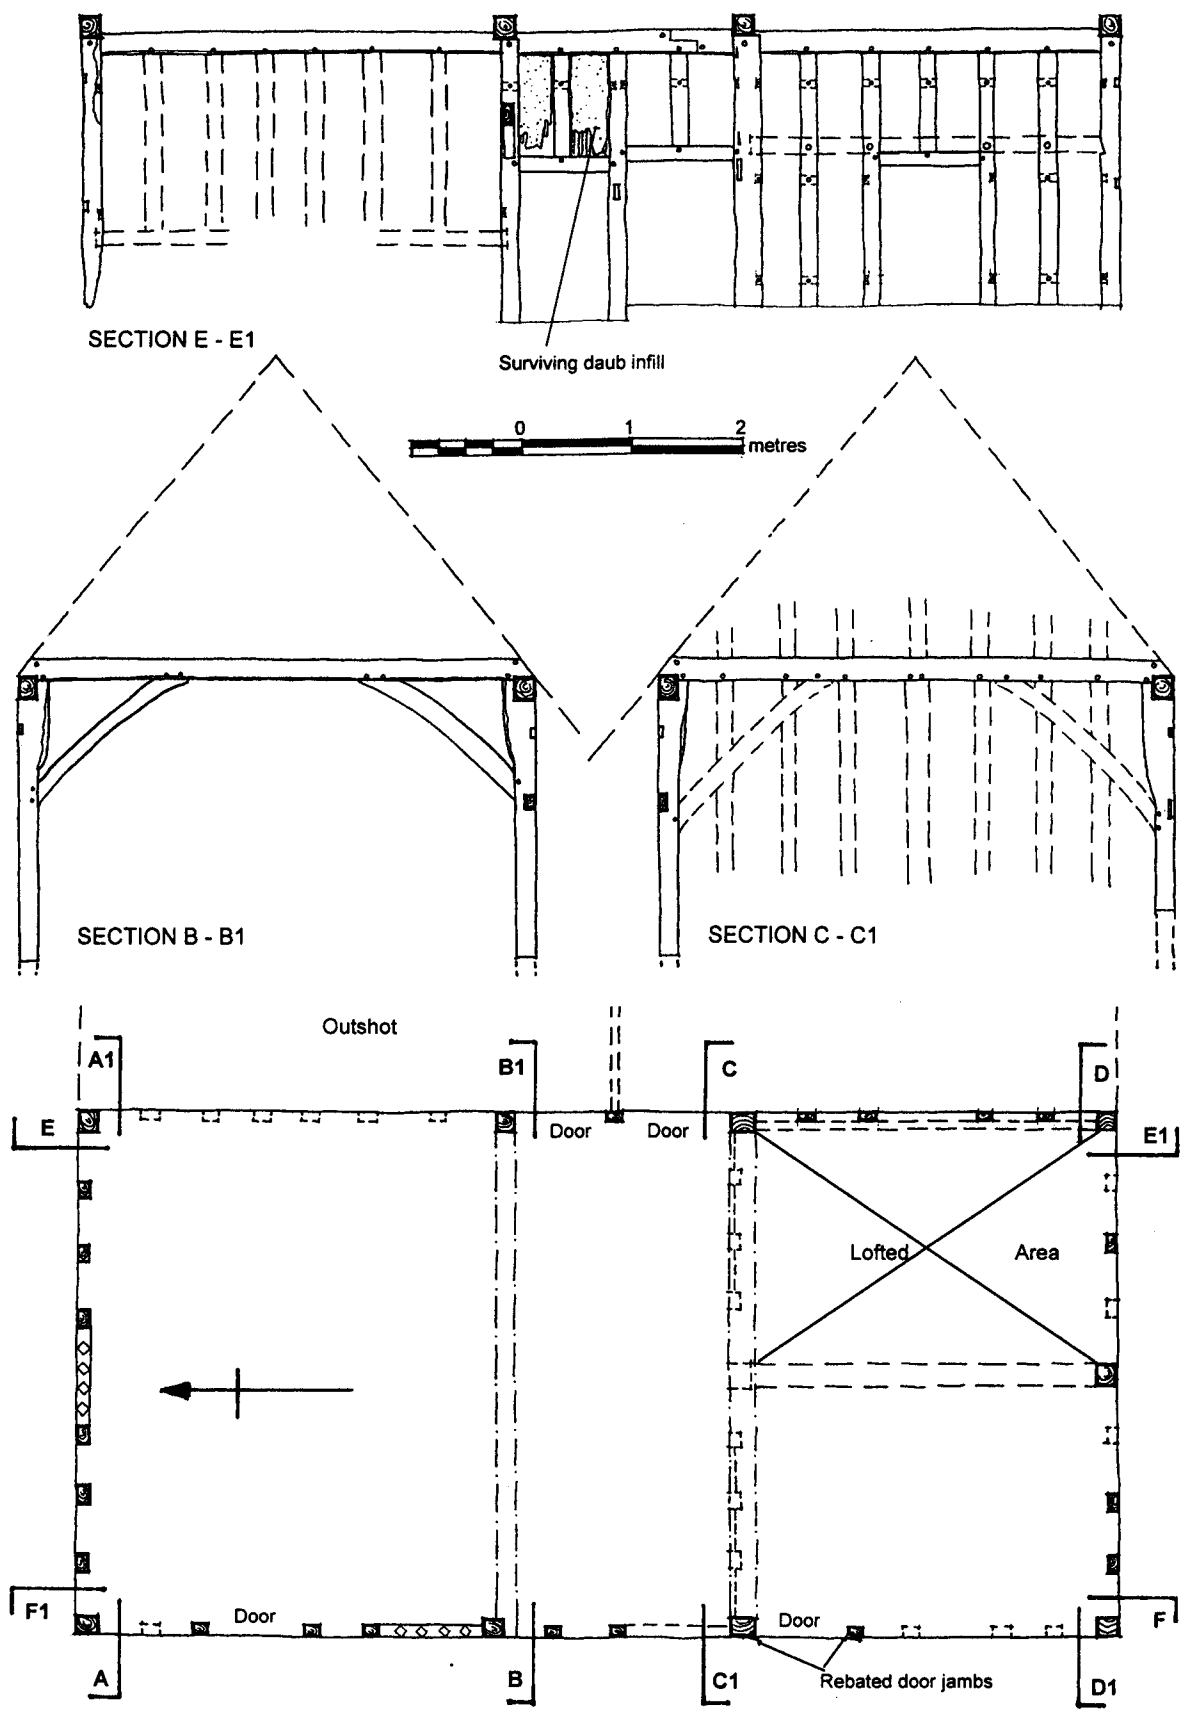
Plan of the outbuilding at Borley Lodge Farm, with elevations of the two internal trusses and the interior of the east wall.
